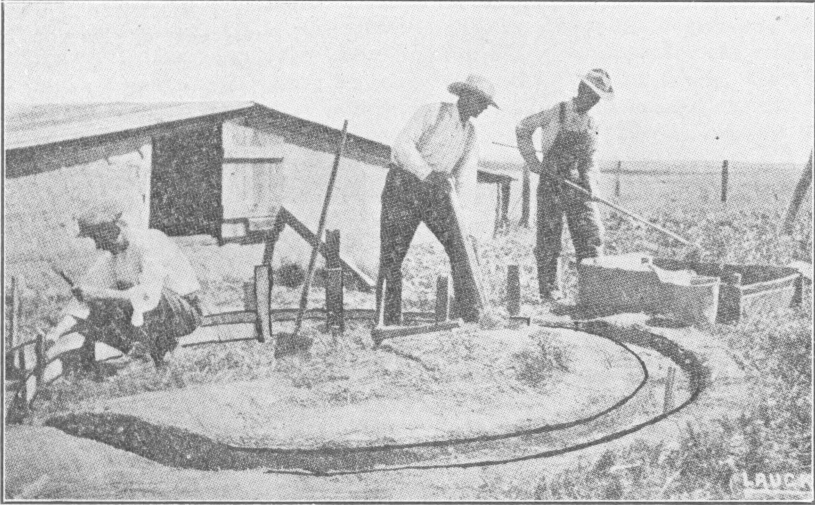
An inexpensive method of building forms for concrete collar which does not extend far above the surface of the ground.
